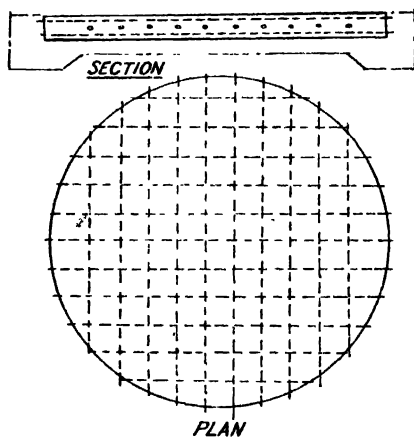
PRESTRESSING CABLES IN TANK FLOOR SLAB
